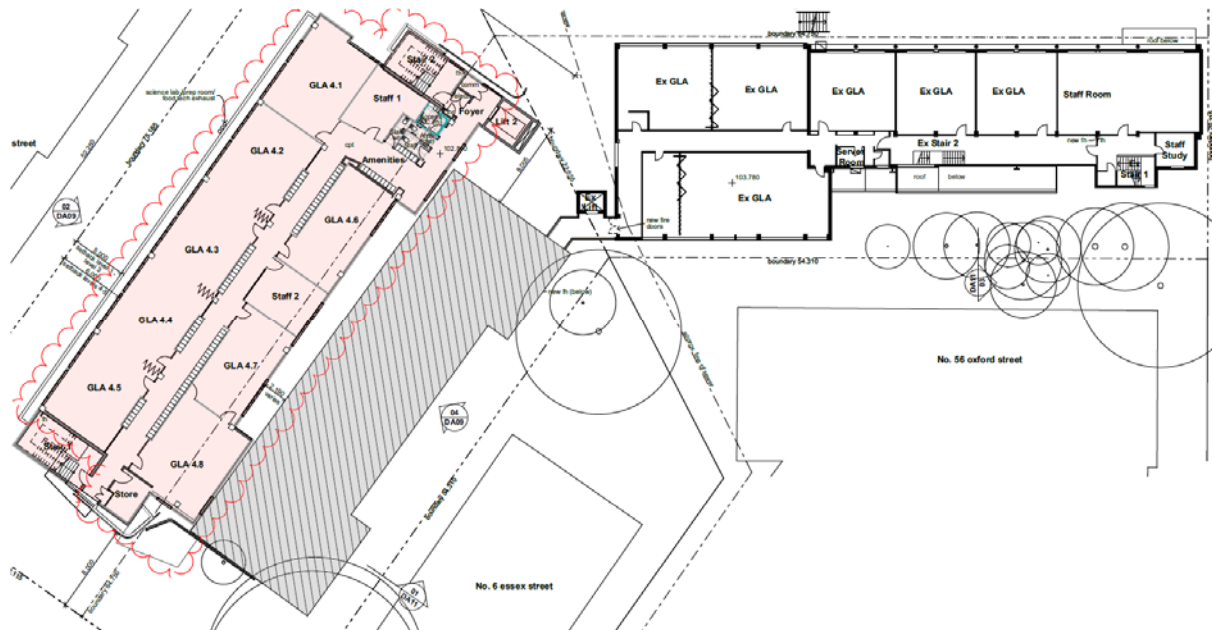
Proposed Level 4 plan under DA/89/2017/C.
